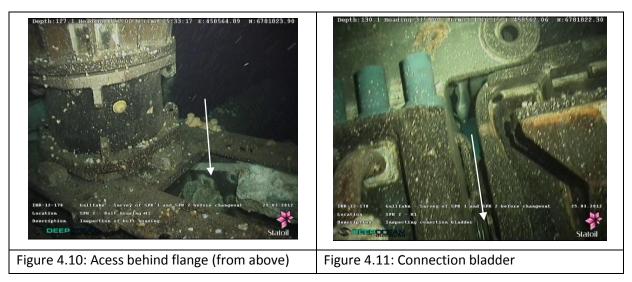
shows the bladder connection between the bolt housing and the locking bolt assembly. The connection joint is connected to the riser above the bolt housing and the locking bolt assembly
